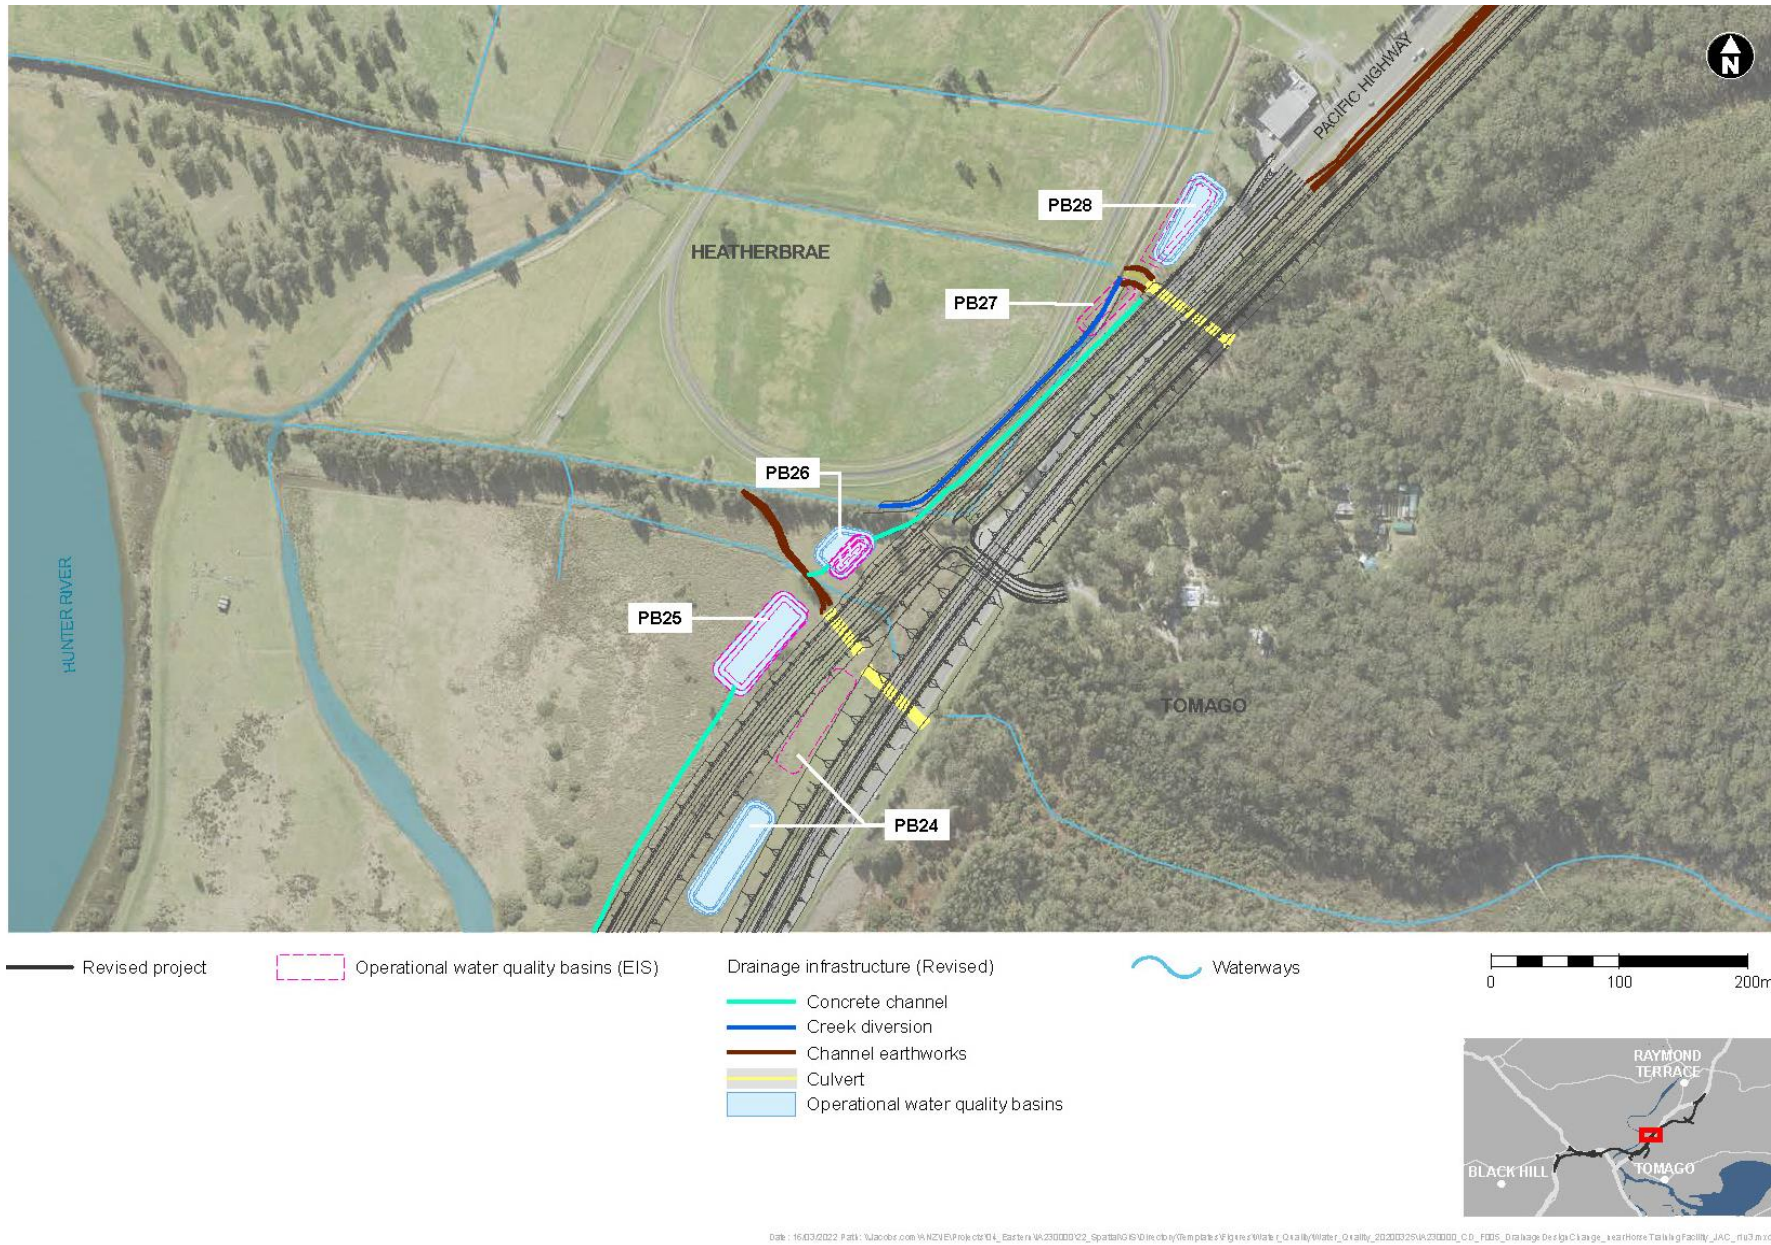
Drainage design change near horse training facility, Heatherbrae
